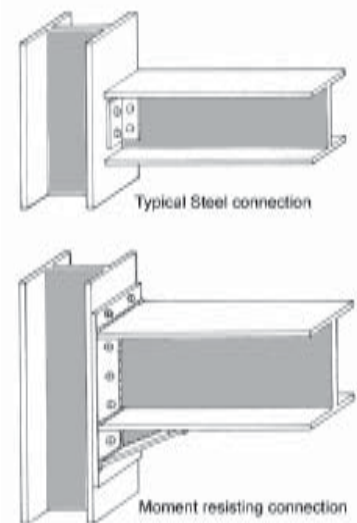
The image shows a moment resisting connection in steel framing compared to a typical pin connection. Welding at the top and bottom flanges will provide more stiffness to the connection, thereby improving structural performance.
